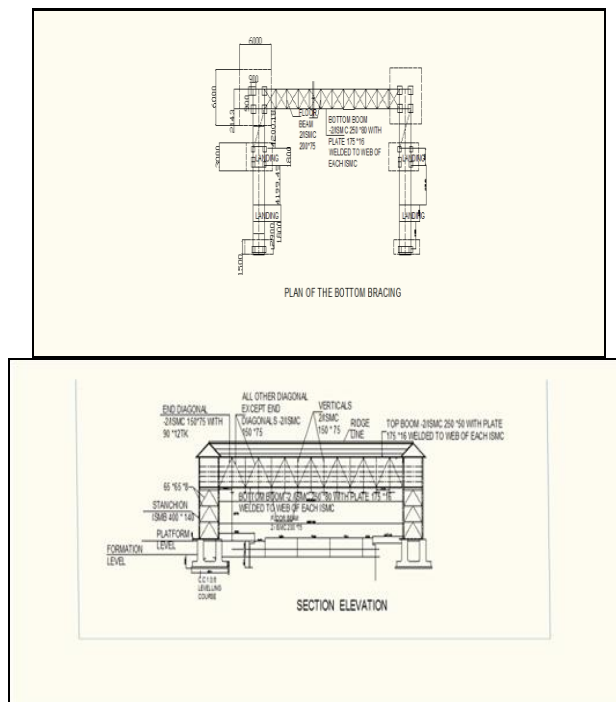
Proposed Plan and Elevation of the Foot Over Bridge
